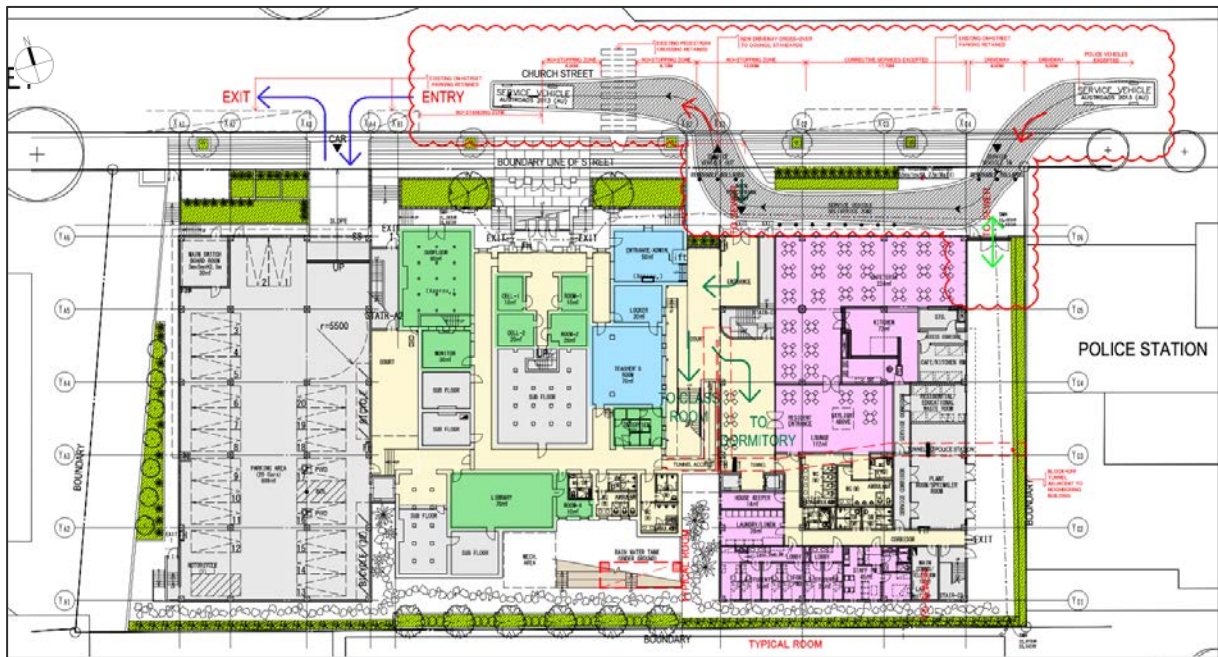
| Service vehicle access arrangement plan (Source: EIS)
